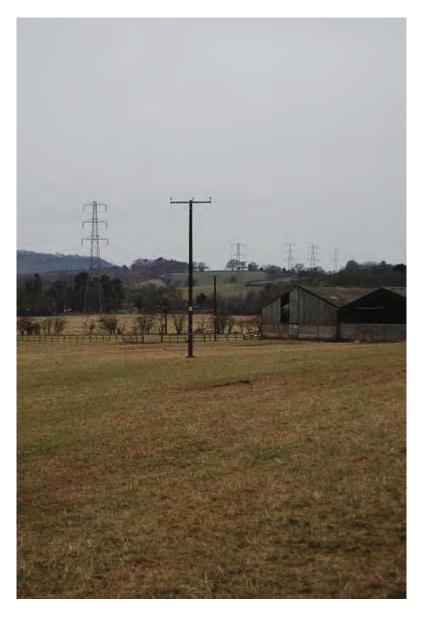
Newly erected pole for overhead lines at site of trench three (foreground) and two (background), looking north west.
